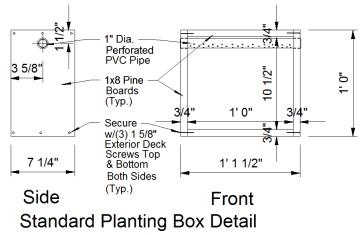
Standard Planting Box Detail Drawing showing structure, Leininger, 2012
